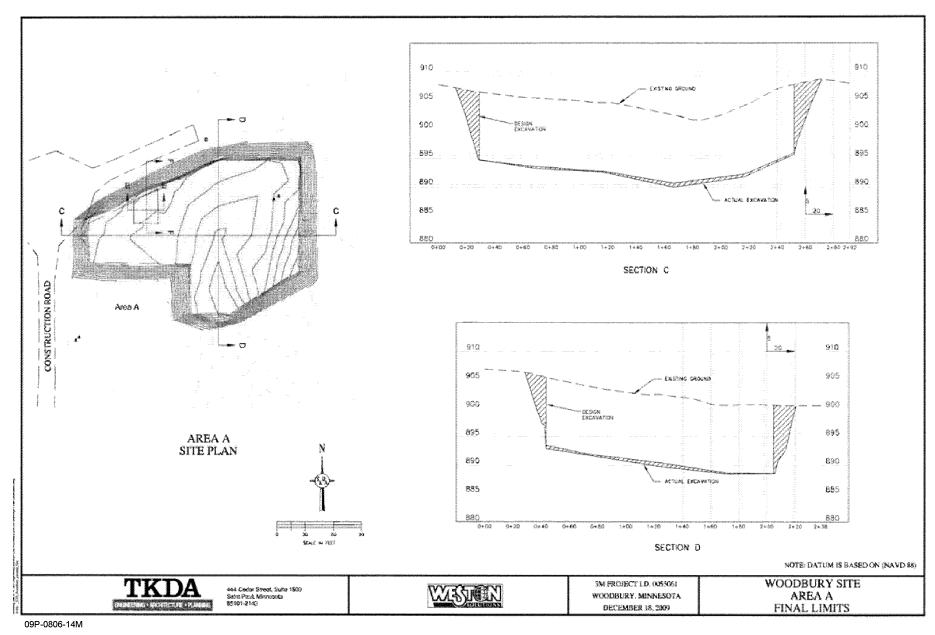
AREA A - FINAL EXCAVATION LIMITS - LAYERS 1 AND 2
